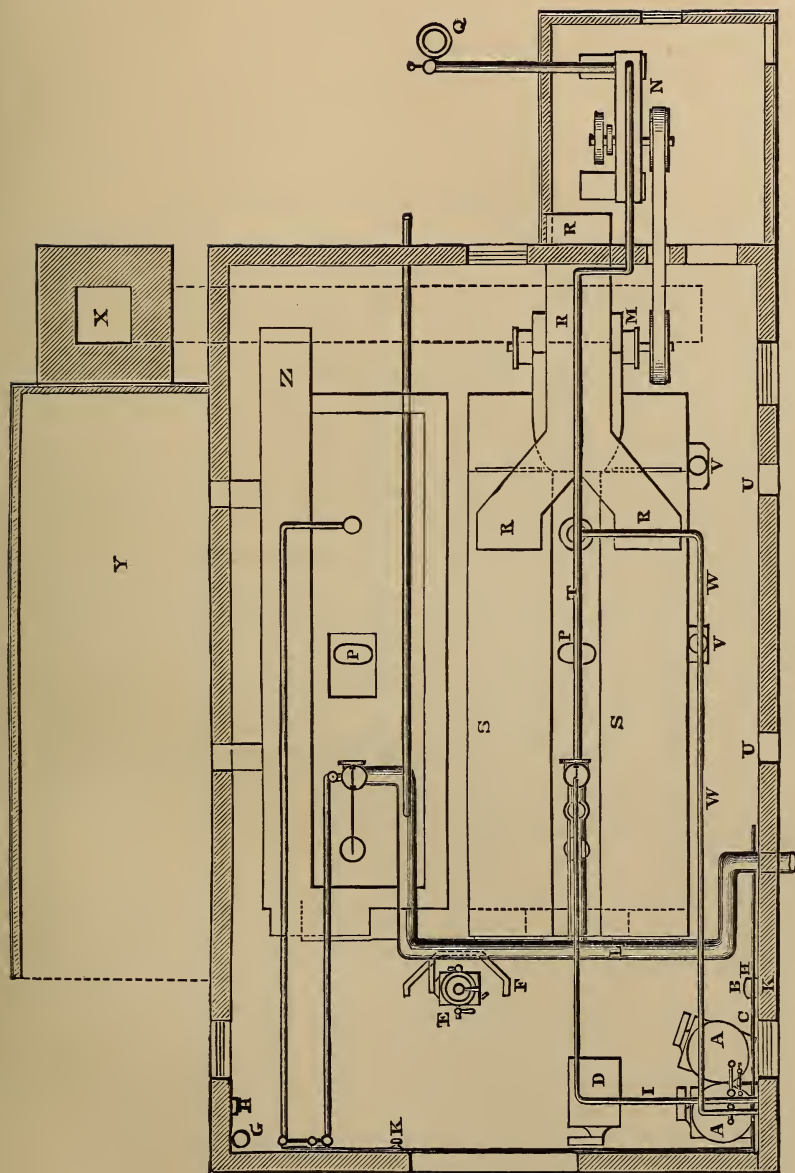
GROUND PLAN OF BOILER-HOUSE.
